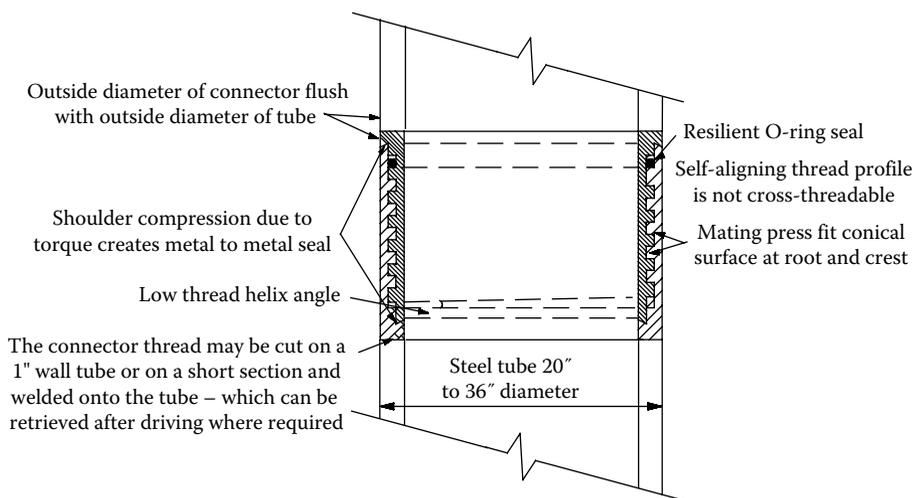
Schematic arrangement of Frank's Double Drive Shoulder Connector.
